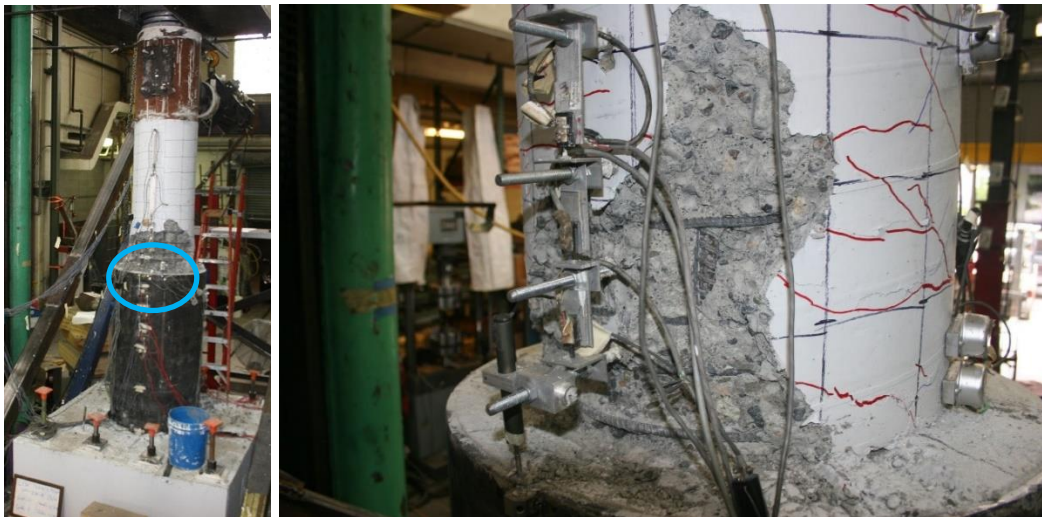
Specimen 30-21-R South Face Buckled Longitudinal Reinforcement Bars at 8.9% Drift
